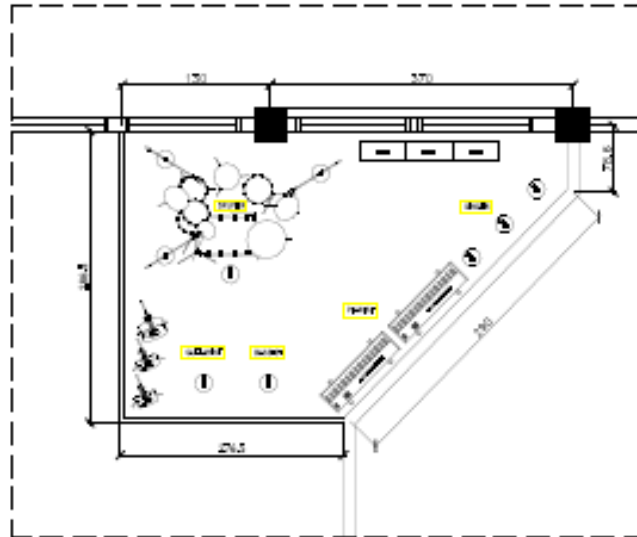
2D Sketch for the Musician Room on the Second Floor of the HKBP Church Building
